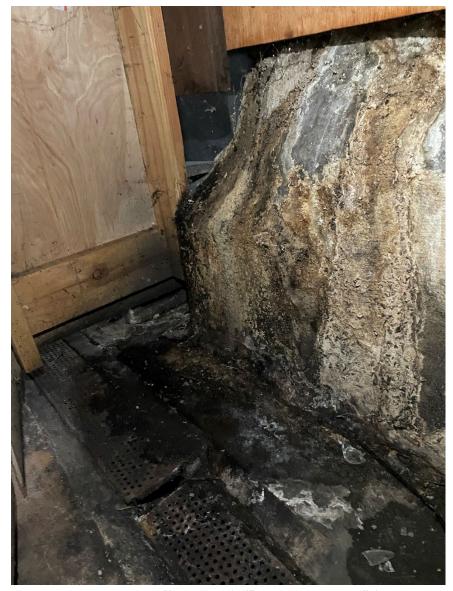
Active water infiltration and efflorescence, west wall, basement.
